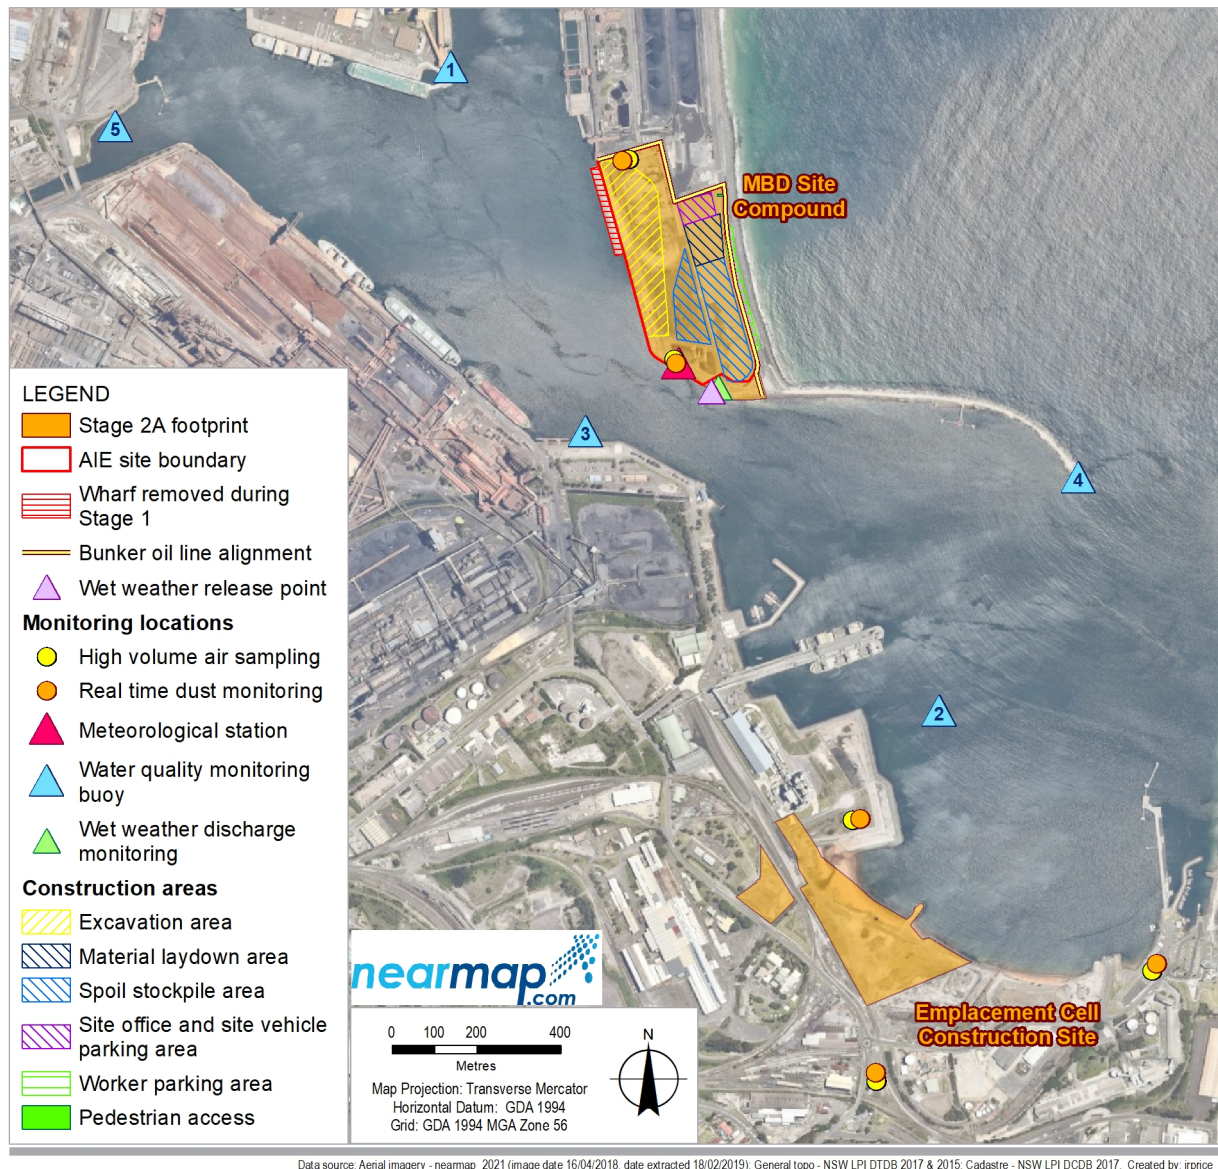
Stage 2A works and location of MBD Site Compound and Emplacement Cell Construction Site
